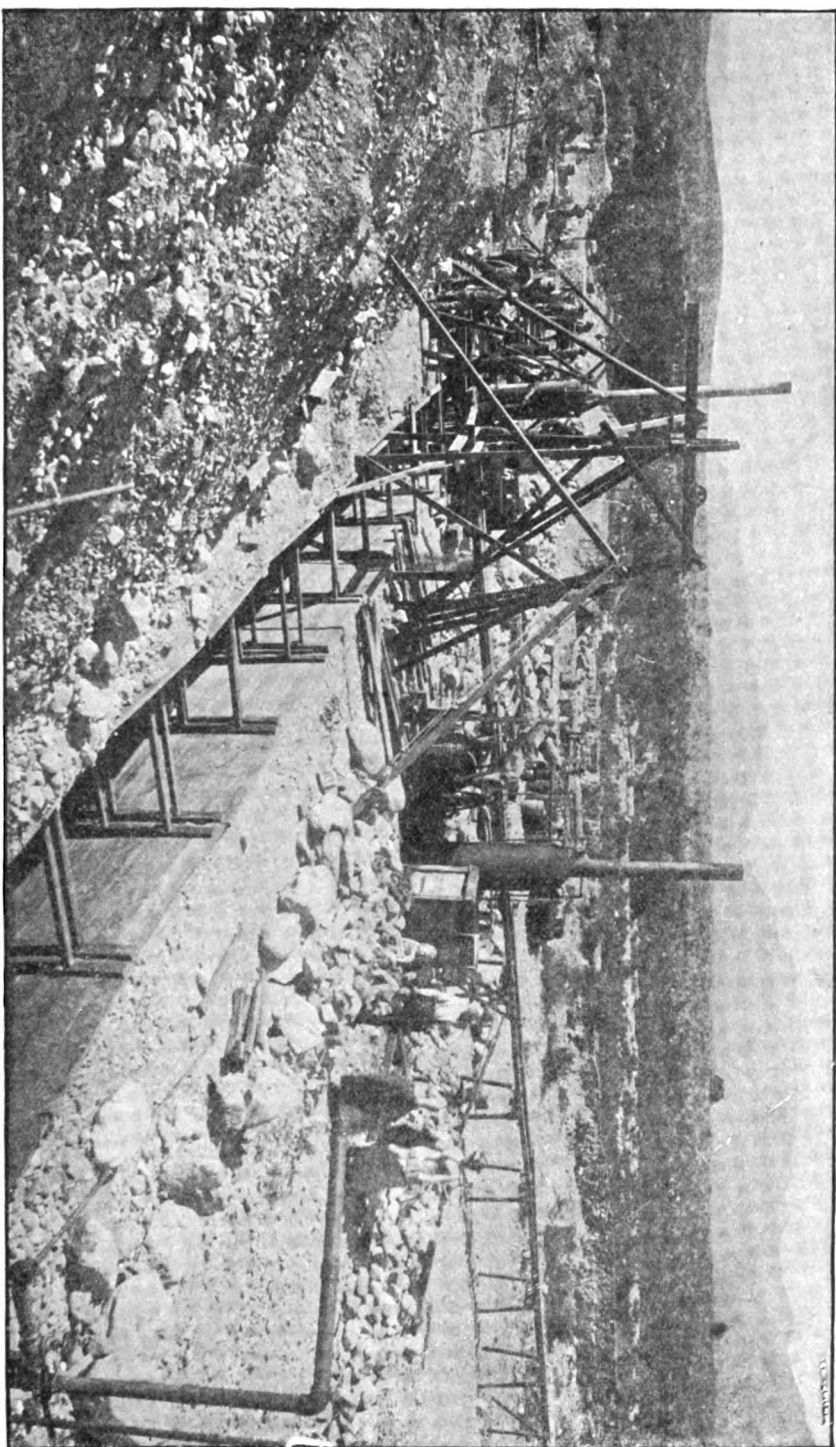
EXCAVATION OF TRENCH FOR PACOIMA SUBTERRANEAN DAM.
